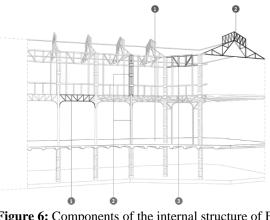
Components of the internal structure of El Mercado. (top) 1) rigid diaphragm 2) cross-linked truss (bottom) 1) lattice beam 2) column 3) bracing (Katherine Cabezas drawing).
